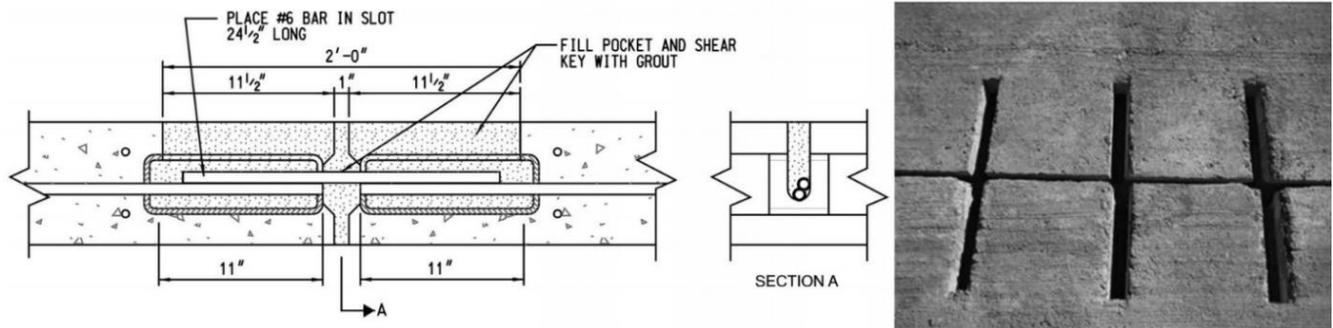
Transverse connection at Live Oak Creek Bridge, Texas [8].
